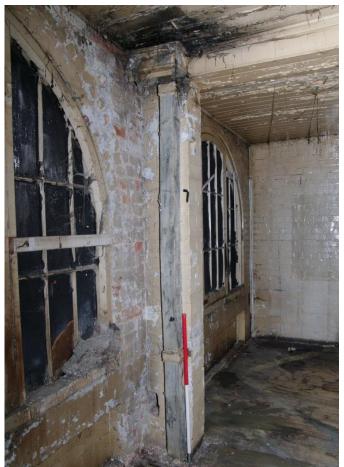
Third floor, internal lead downpipe and hopper Looking east. 1m scale
